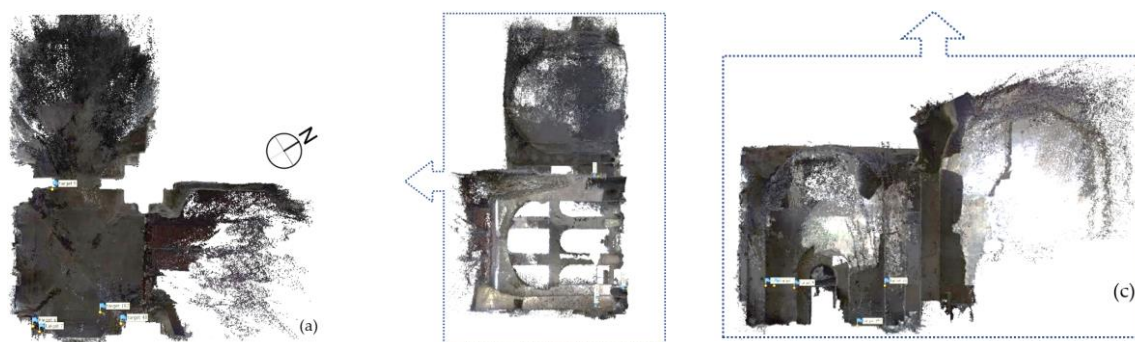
Merged Point Cloud from the UAV and digital camera capturing: (a) plan view, (b) elevation of Hall I and Hall II from the northeast side, (c) elevation of Hall I and Hall IV from the southeast side.
